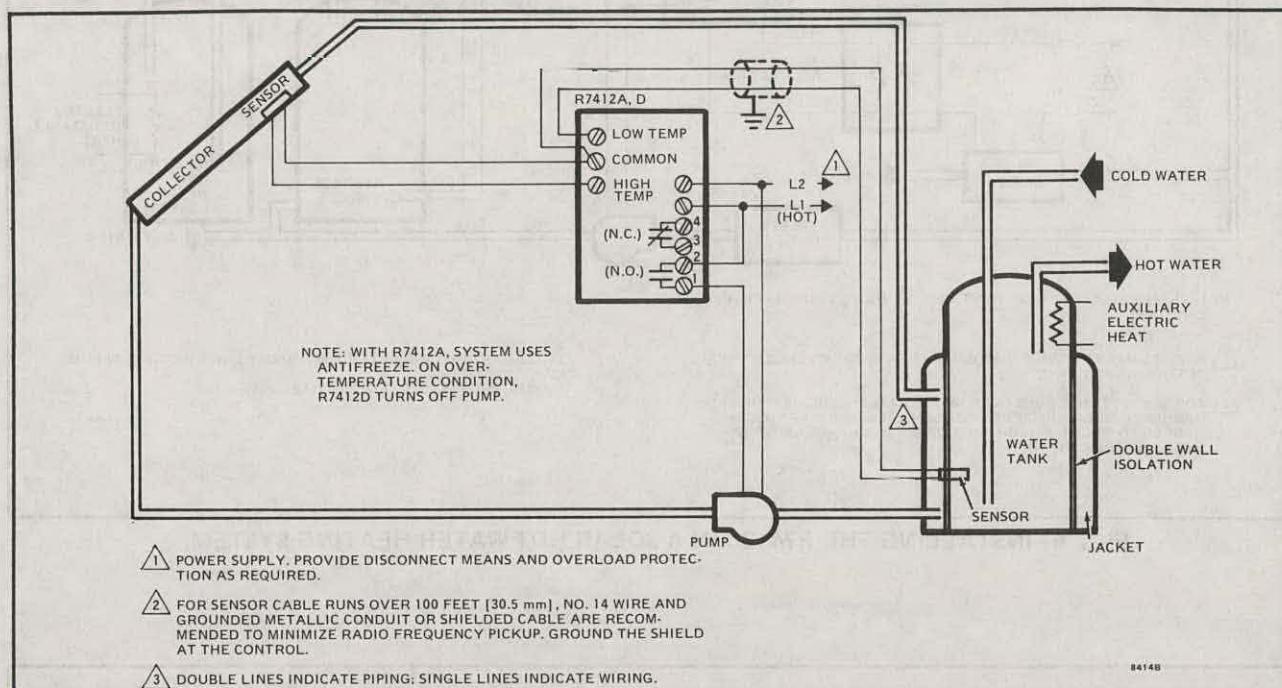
USING THE R7412A,D WITH A SOLAR WATER HEATER.
